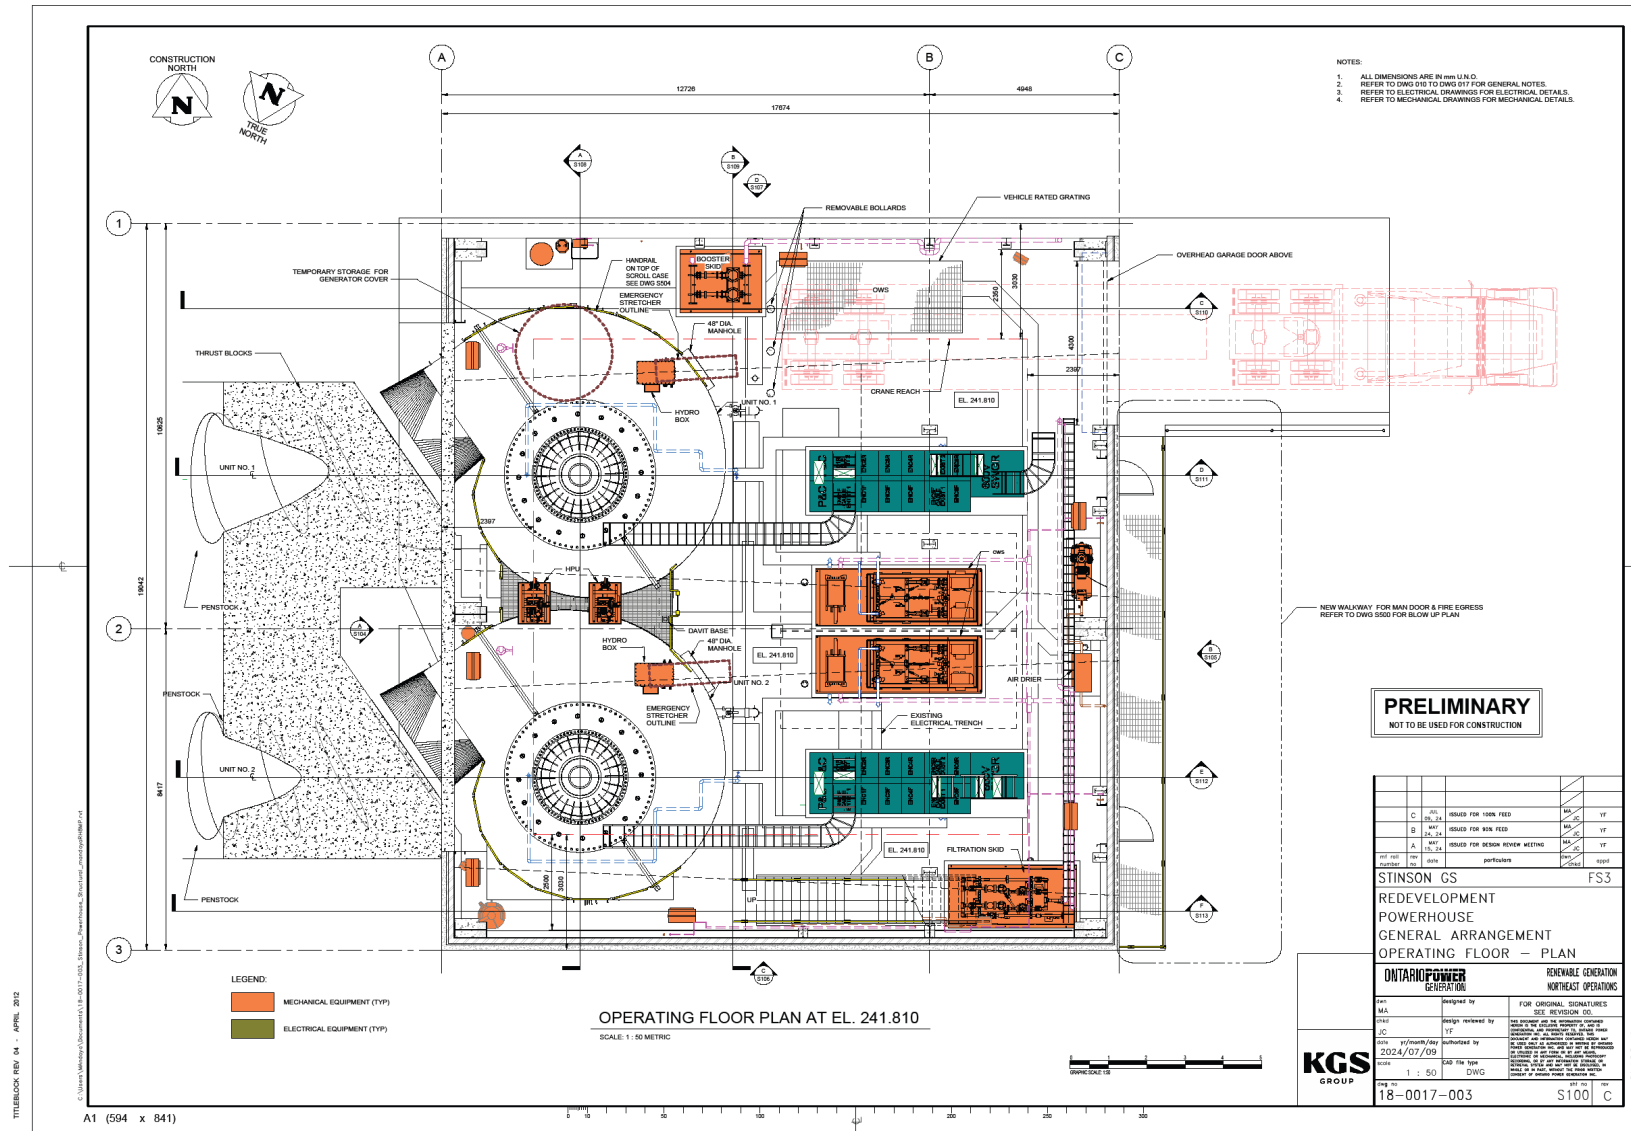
General Arrangement of the Powerhouse Operating Floor Plan
